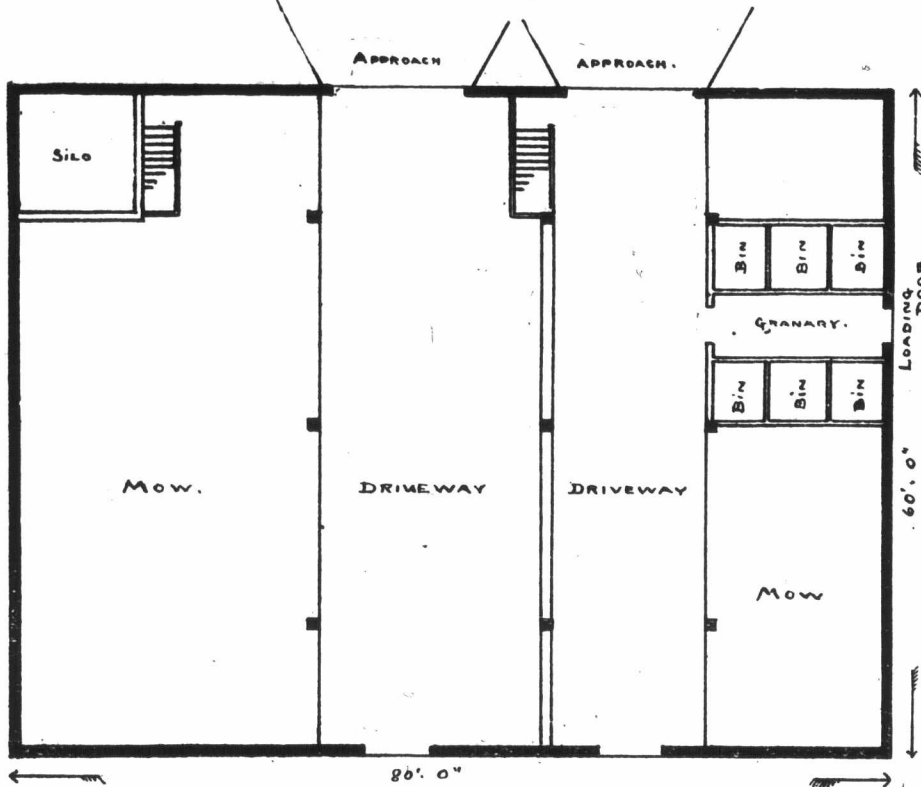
FIG. A. — BARN FLOOR PLAN — SIDE DRIVE.
